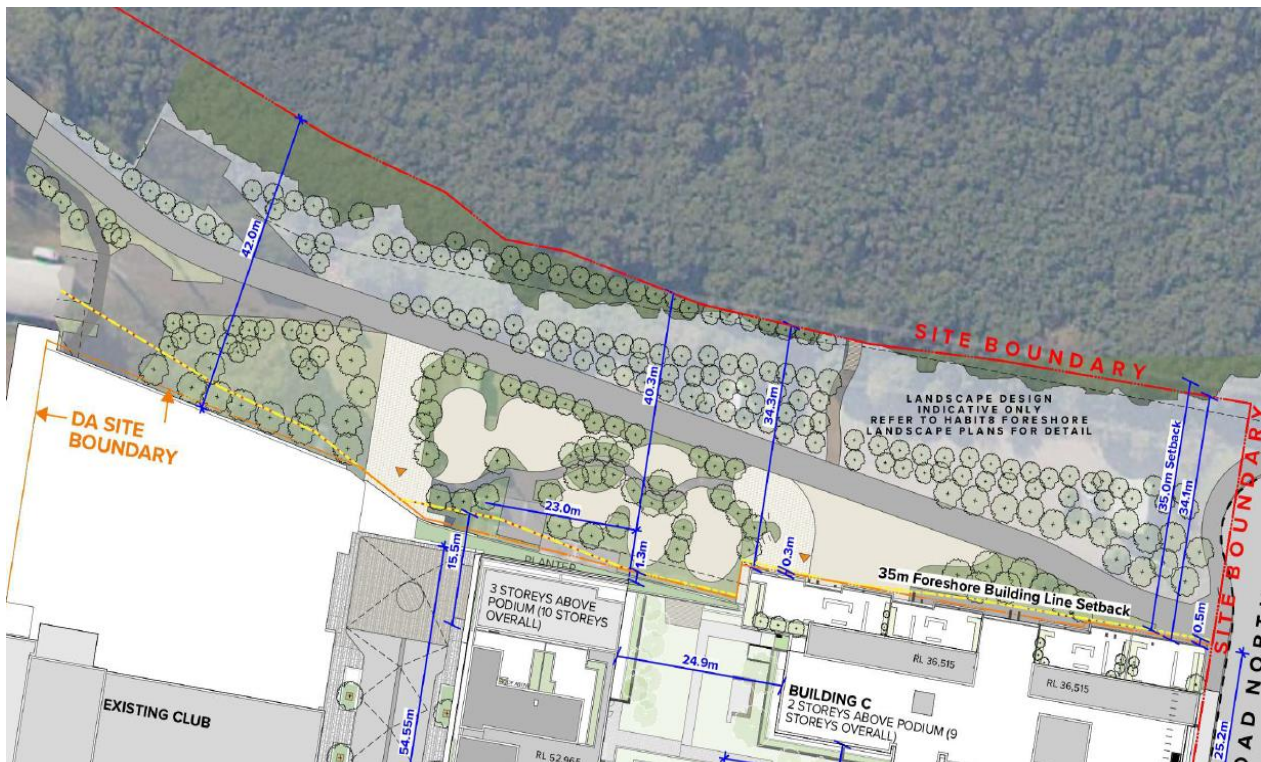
Site plan of the proposed development showing foreshore setbacks.
